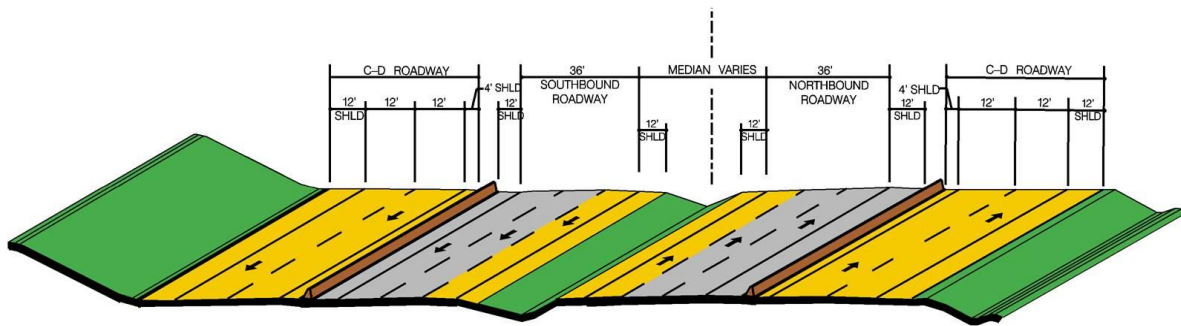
Typical Section Alternate 3A - Inside Widening with C-D Roads
